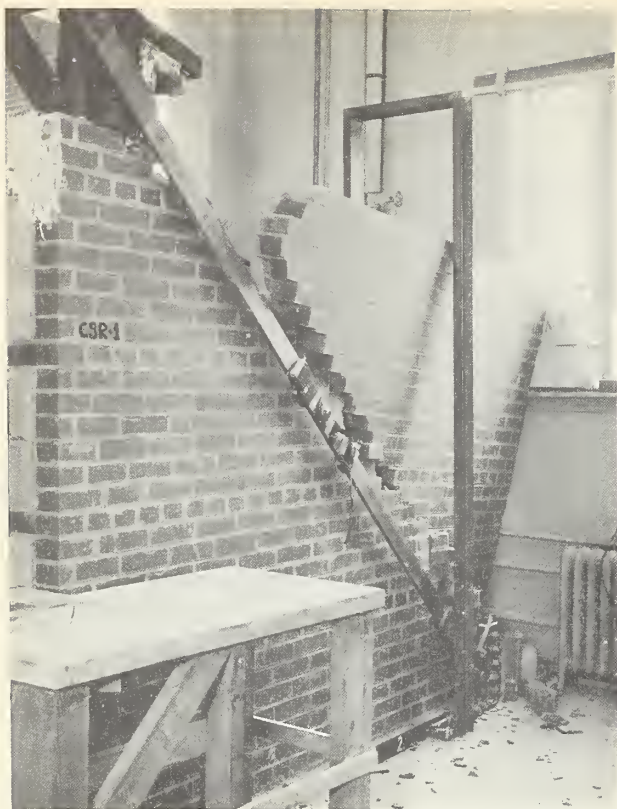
Shear failure in brick facing of composite masonry wall CS-1.
